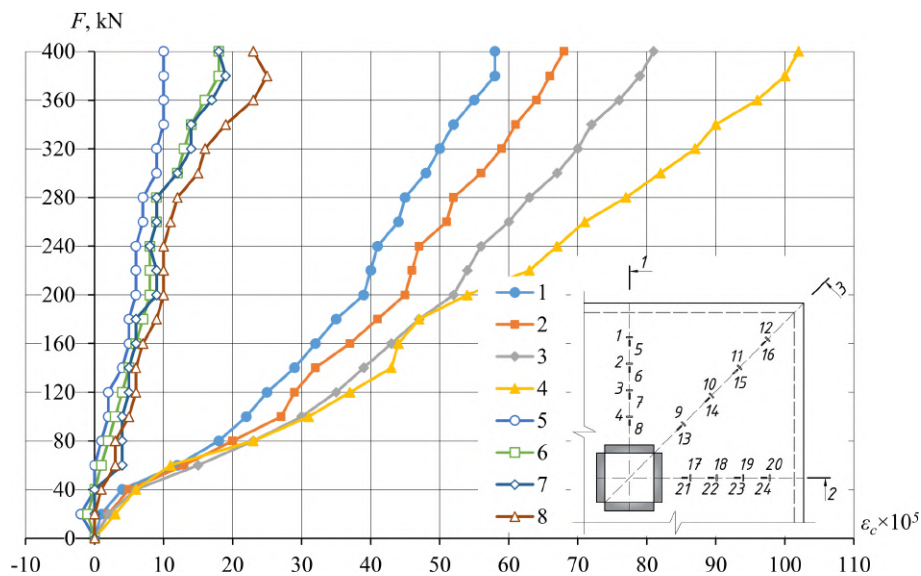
Compressed concrete strains of the PO-3 over-columned slab during loading in section 1-1.
